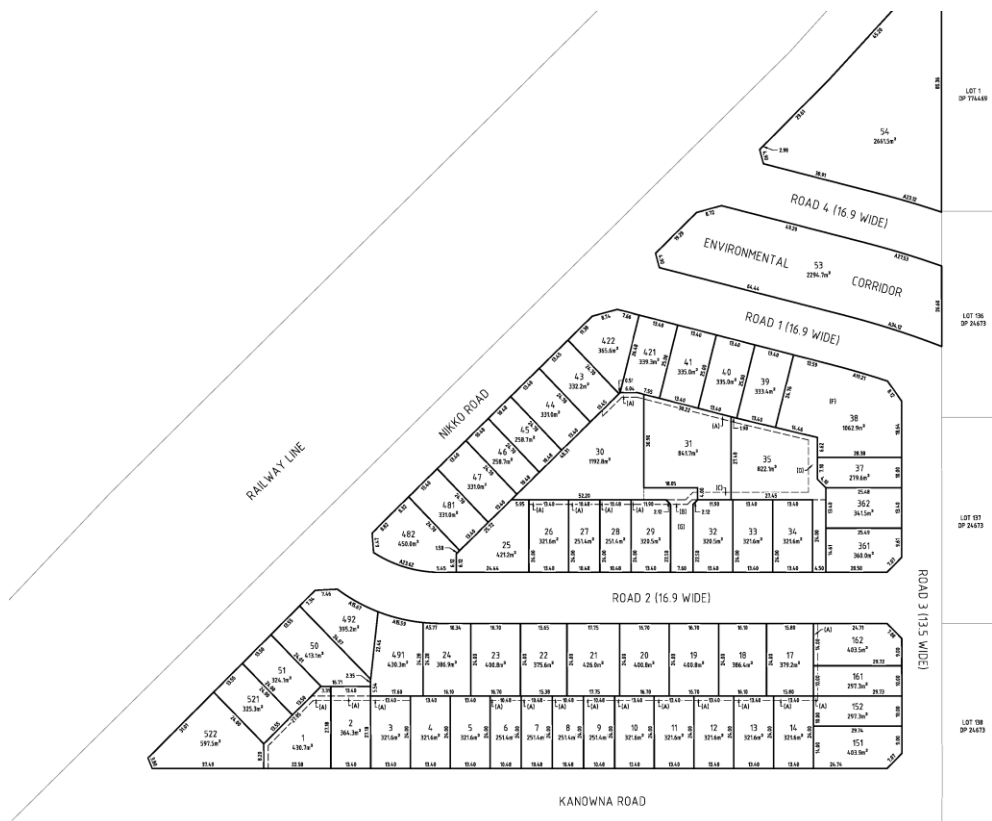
Indicative DCP road layout plan and proposed subdivision plan
